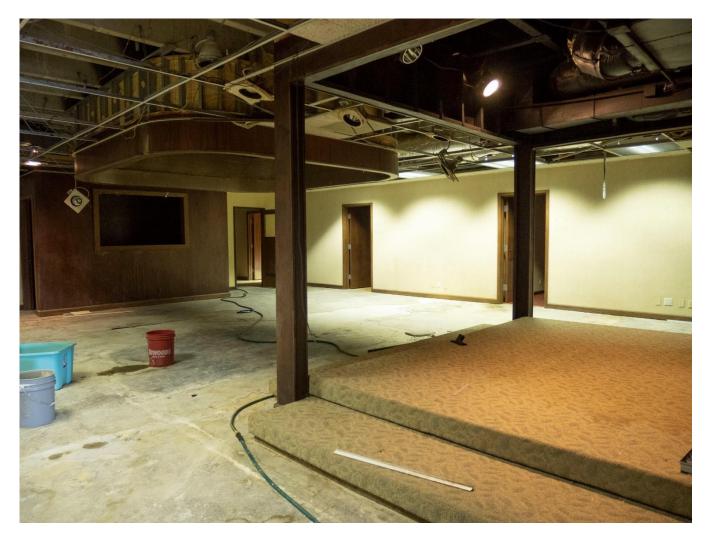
First Wichita National Bank 4th floor corridor. View northeast.
